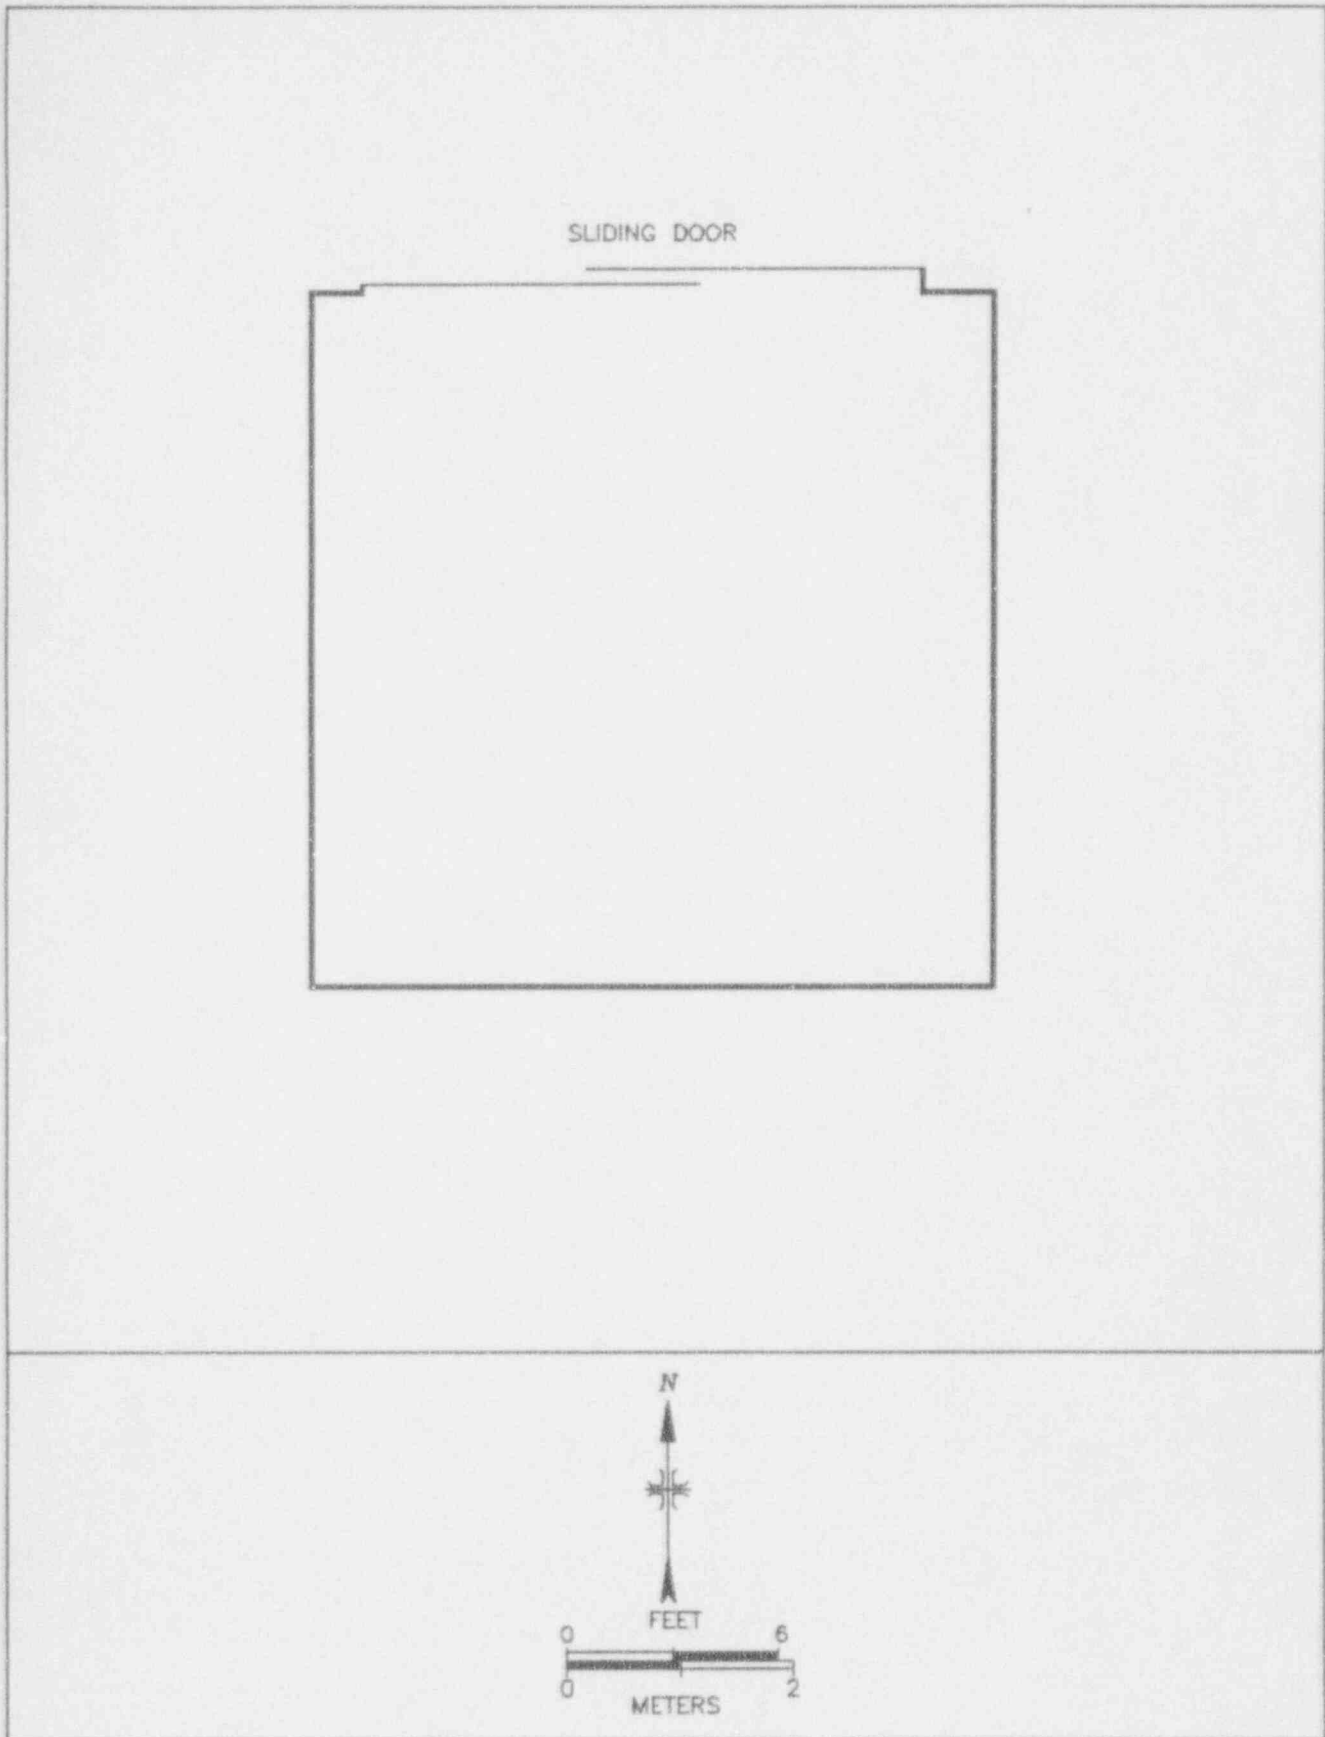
Multiple Failure Building – Floor Plan
